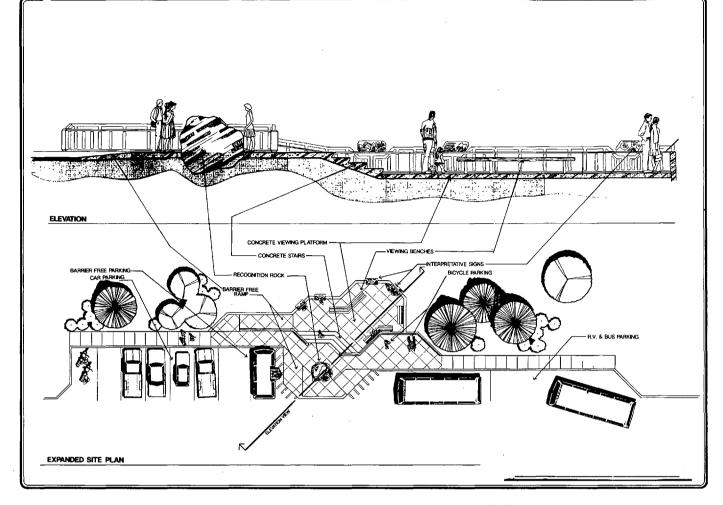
Section detail (top) and plan (bottom) of standard plan for proposed interpretive facilities.
